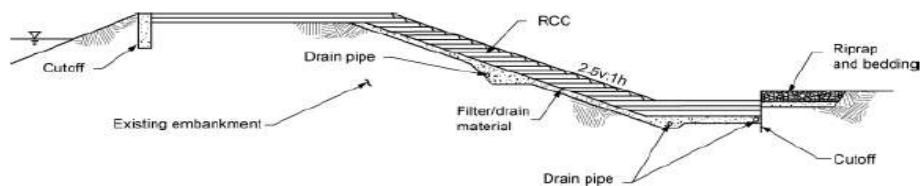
Typical section: RCC overtopping protection (PCA, 2002).
